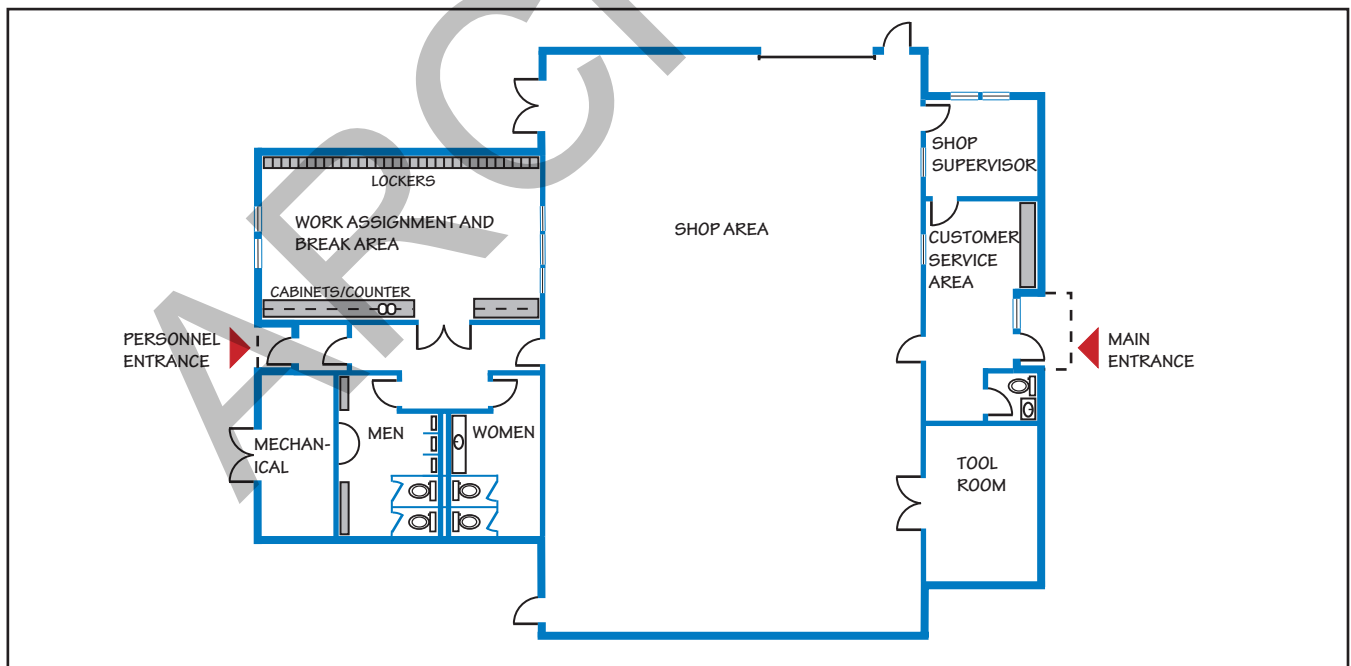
J: Typical Zonal Maintenance Shop Concept Floor Plan (Outside the CE Complex).
